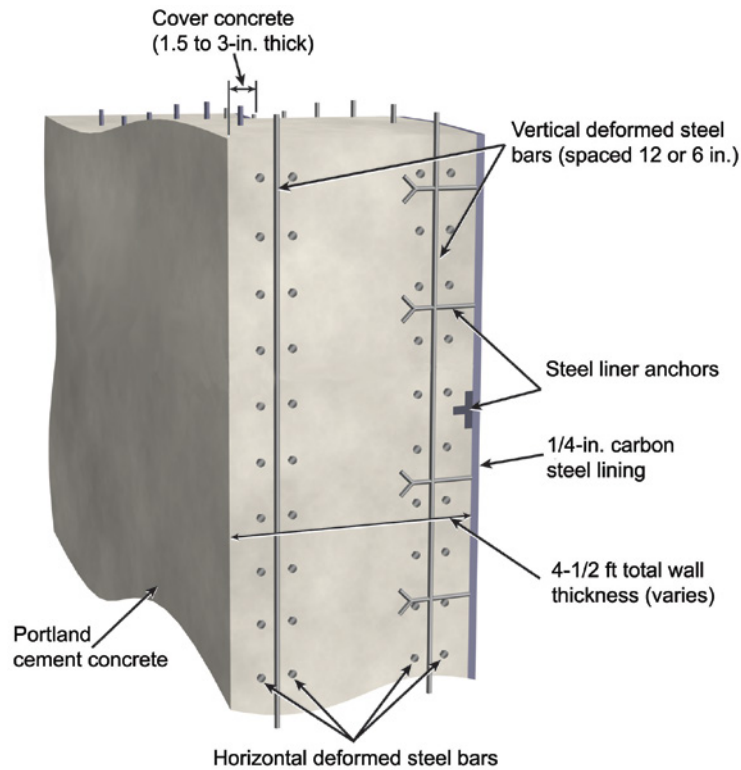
Schematic of Typical Reinforced Concrete Reactor Containment Wall. Adapted from Shah and Hookham (1998).
